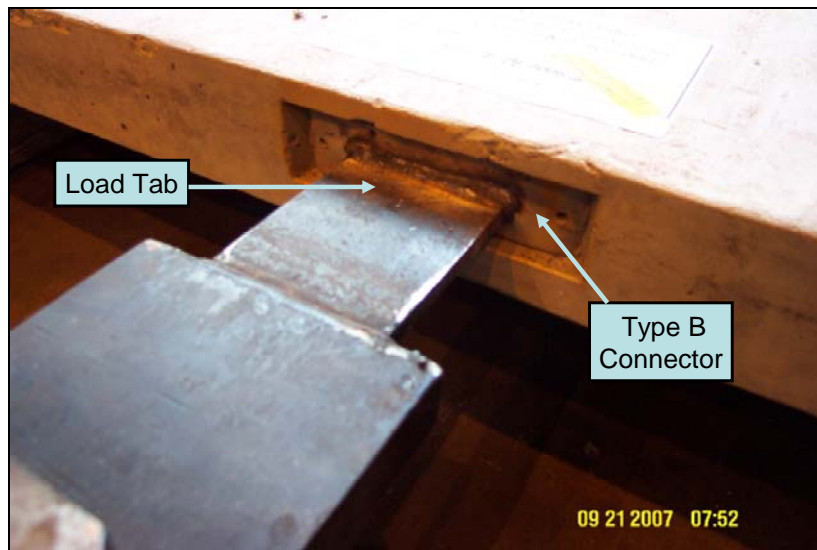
Load attachment plate welded to Type B Connector for in-plane tension test setup
